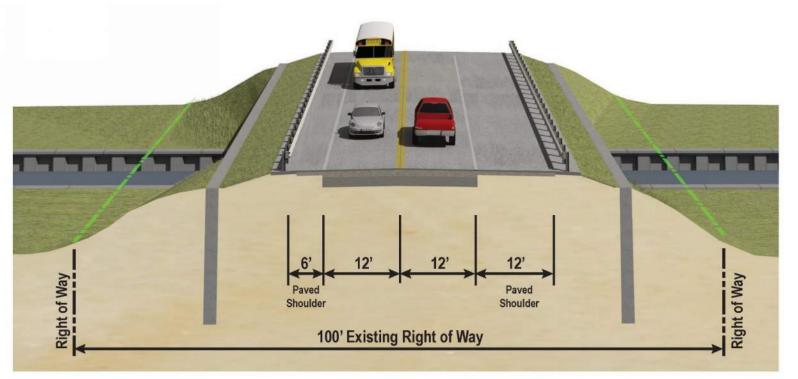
Existing Bridge Typical Section – Lake Conine Canal
